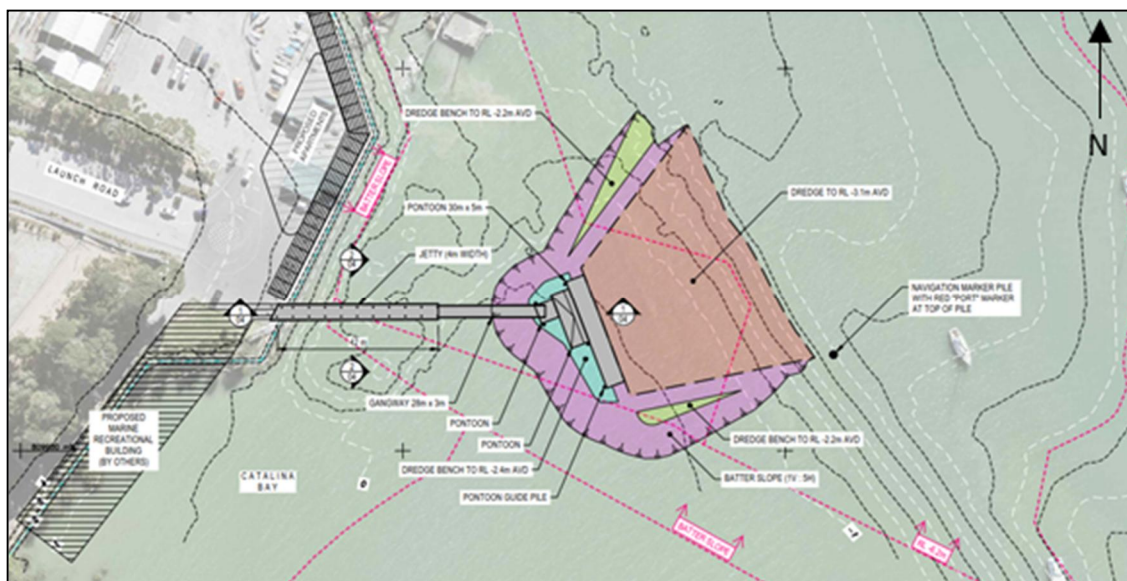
Water access jetty and pontoon layout (dwg. 1006452-RC02)
